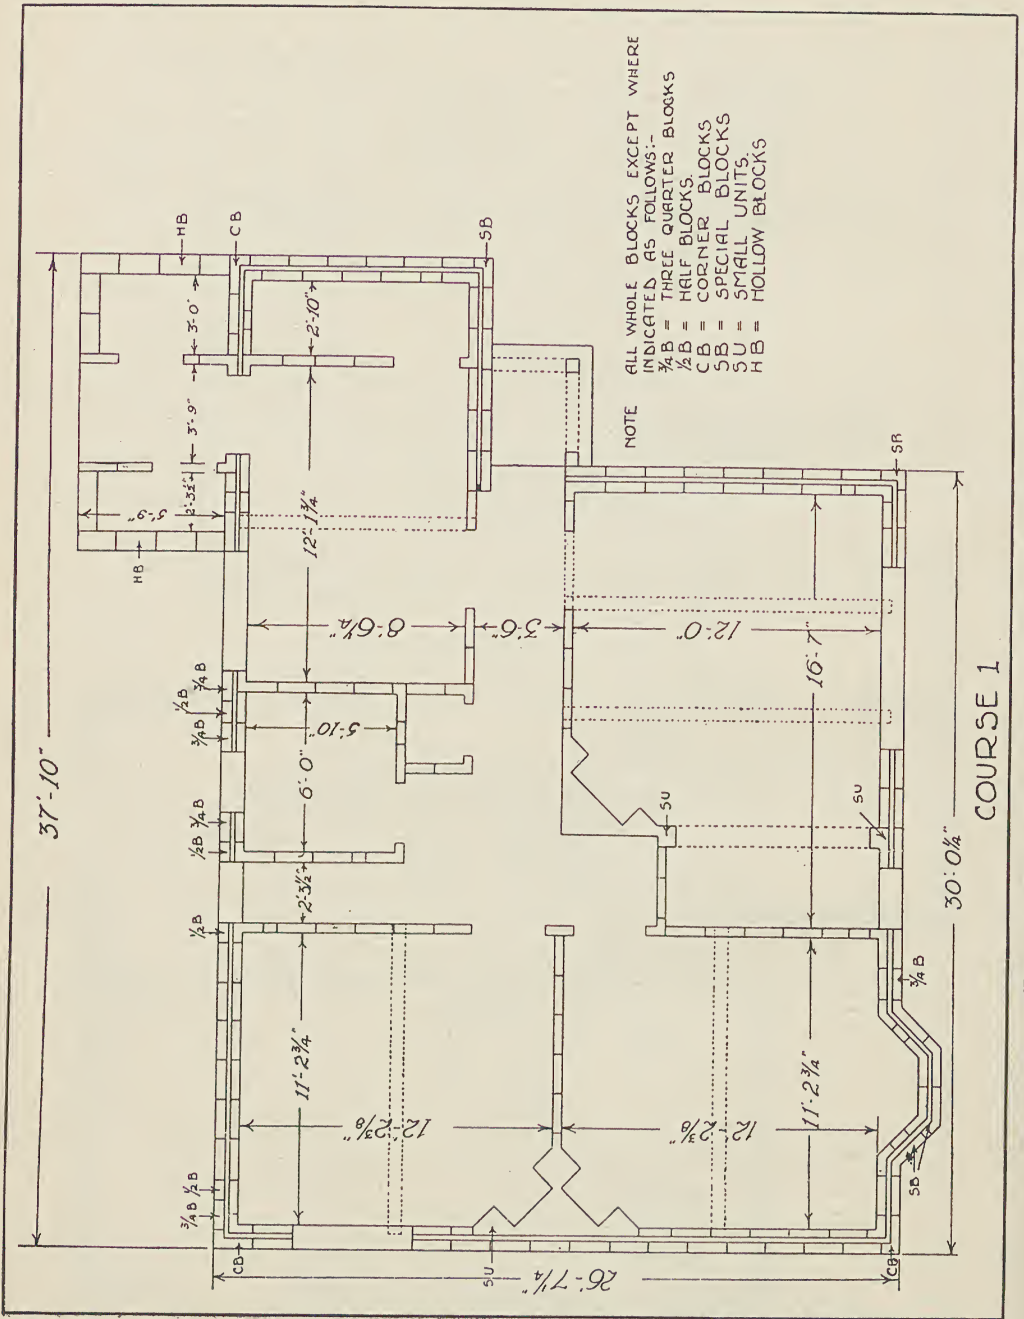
TYPE NO. 5: PLAN SHOWING BONDING OF BLOCKS.
